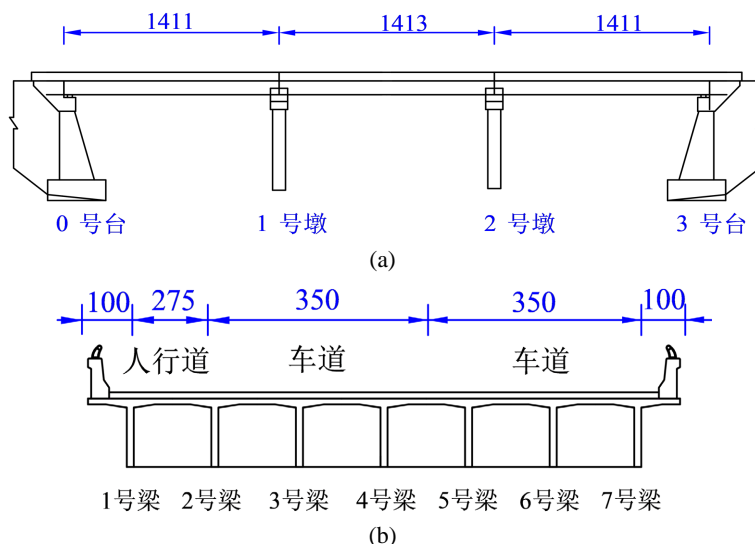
Layout of bridge (unit: cm). (a) Elevation of bridge; (b) Elevation of bridge
